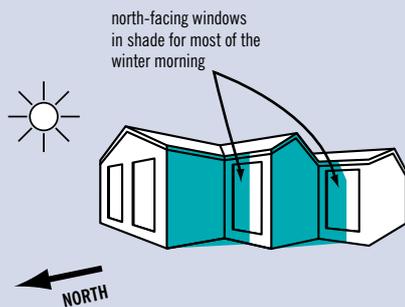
East and west-facing walls can shade adjacent north-facing windows in winter
